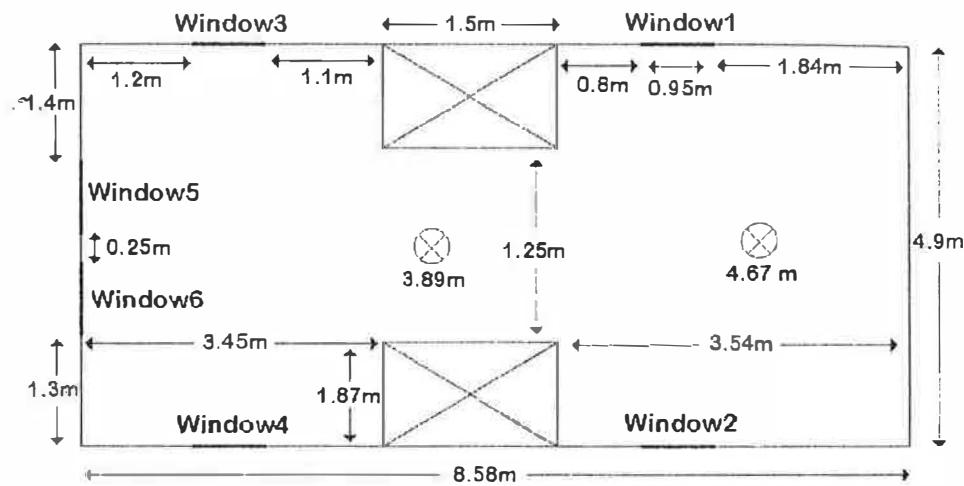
Plan of the zone where experiments have been carried out in the NOA building.
